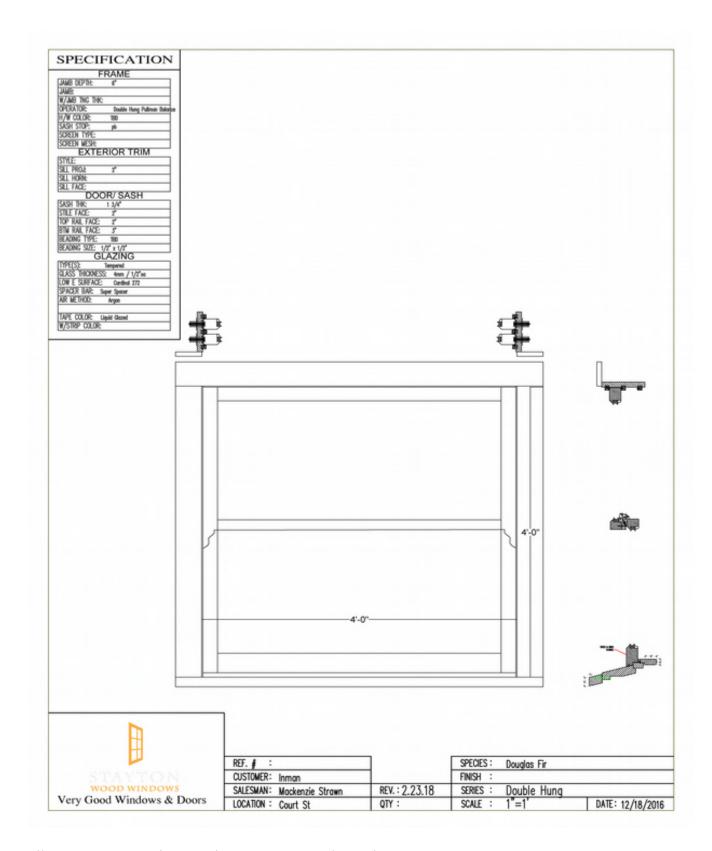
Kitchen Window - Stayton Windows Shop Drawing
